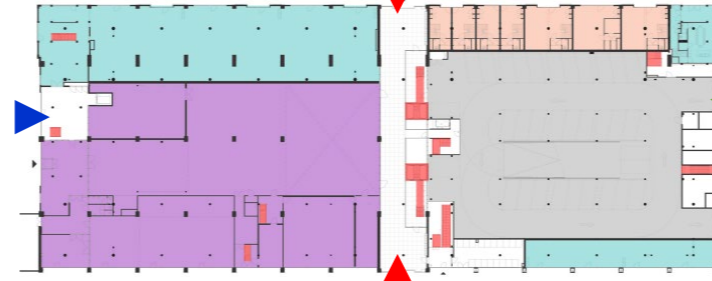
Ground floor plan/ source: ArchDaily.com edited by the author
